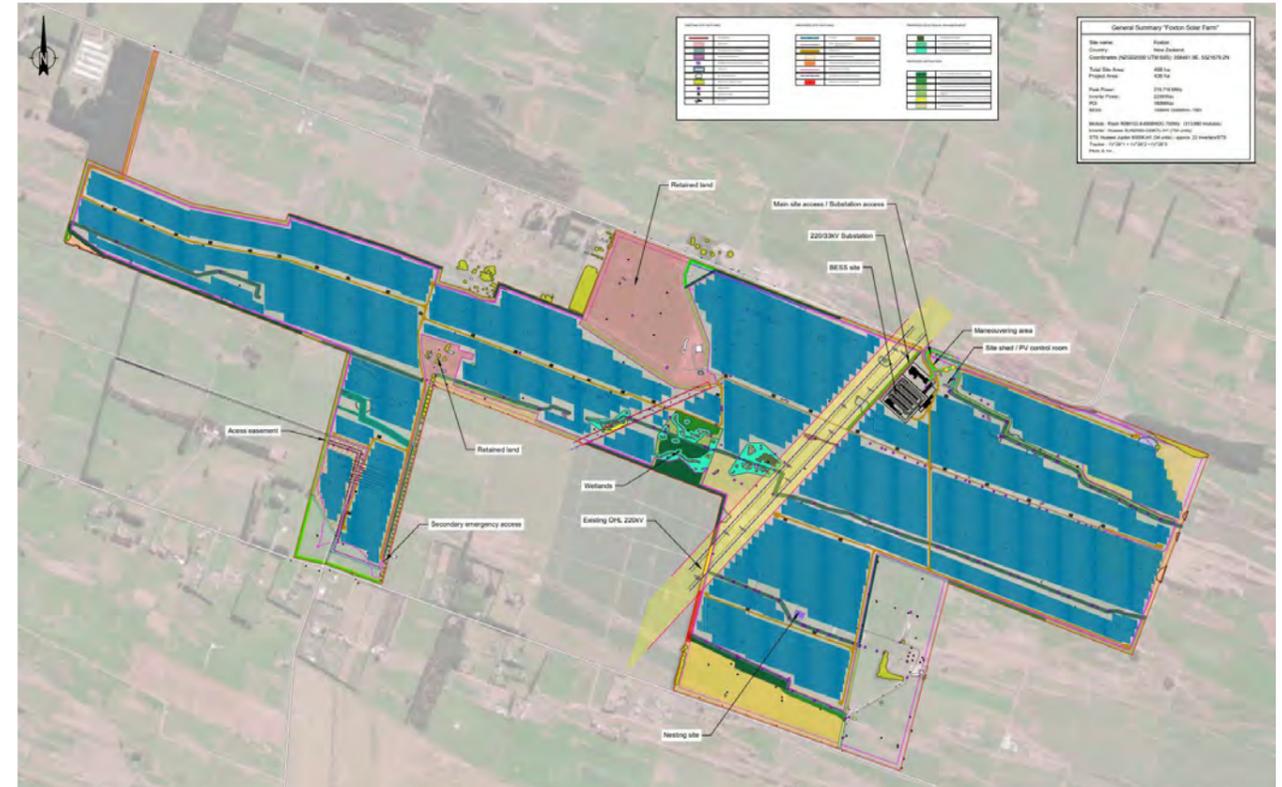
Inset of plan LA04 of GS - Proposed General Layout
